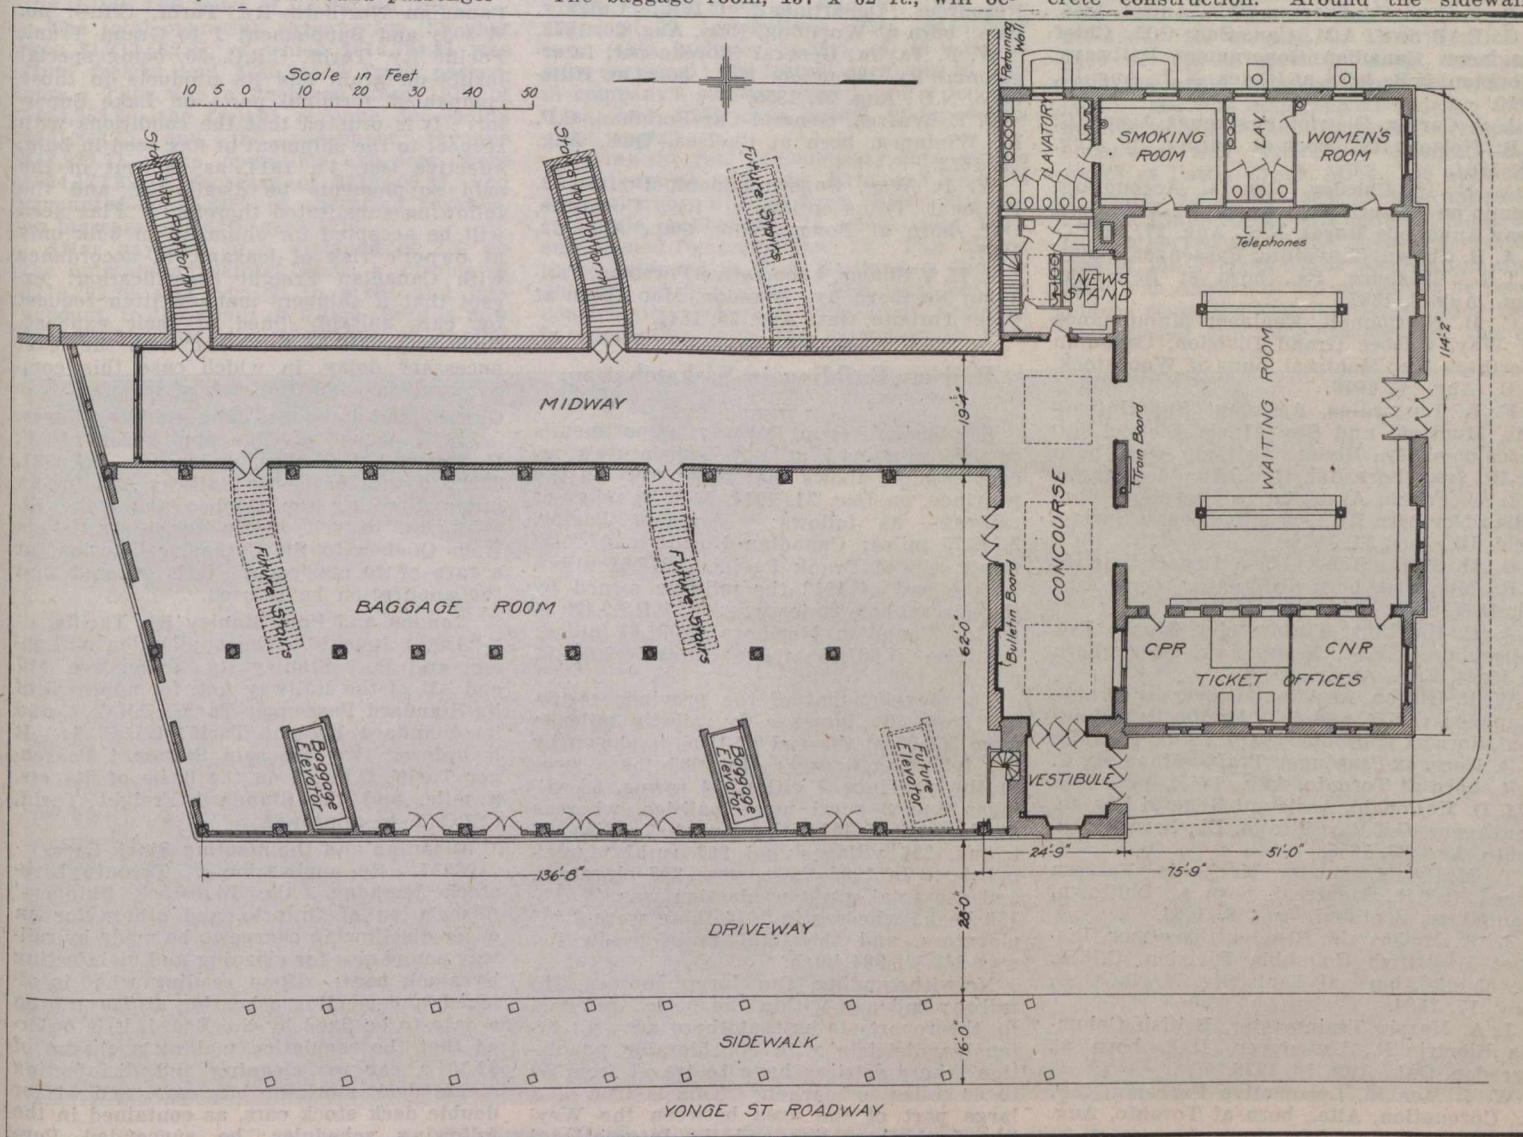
Ground Floor Plan of New North Toronto Station.
